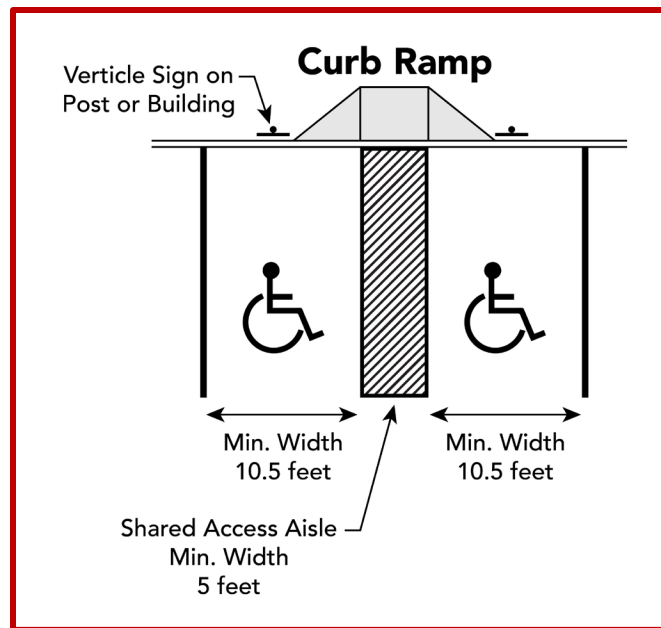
Accessible Parking Stall and Walk Aisleway Dimensions
